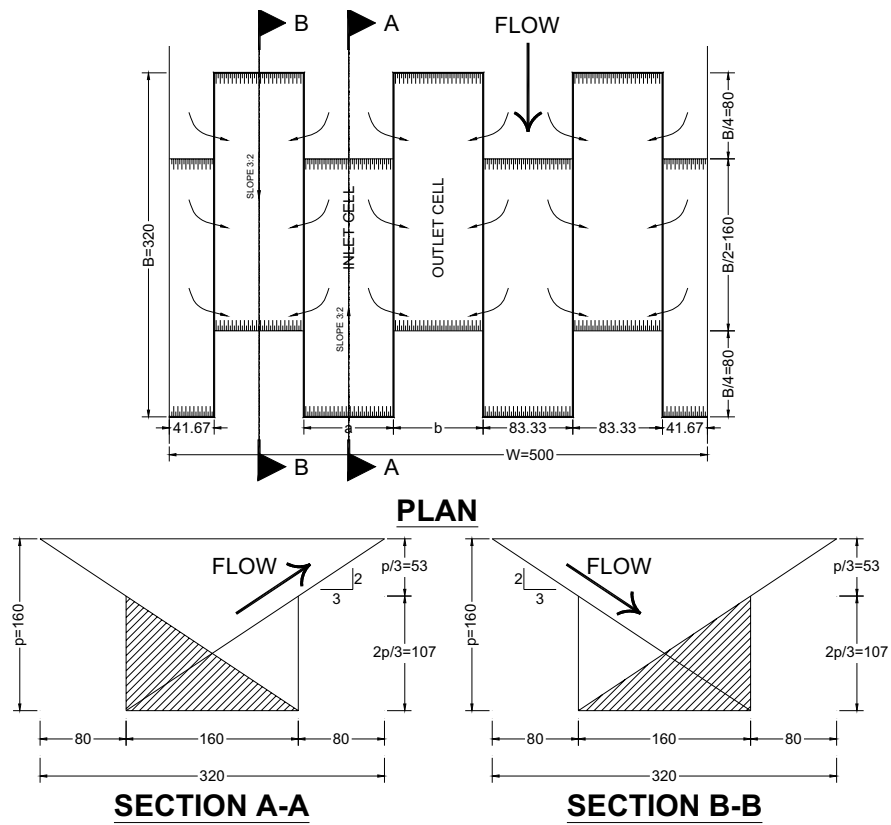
Plan and section of model P₃M₆ (both sides ramping), (dimensions in mm)
